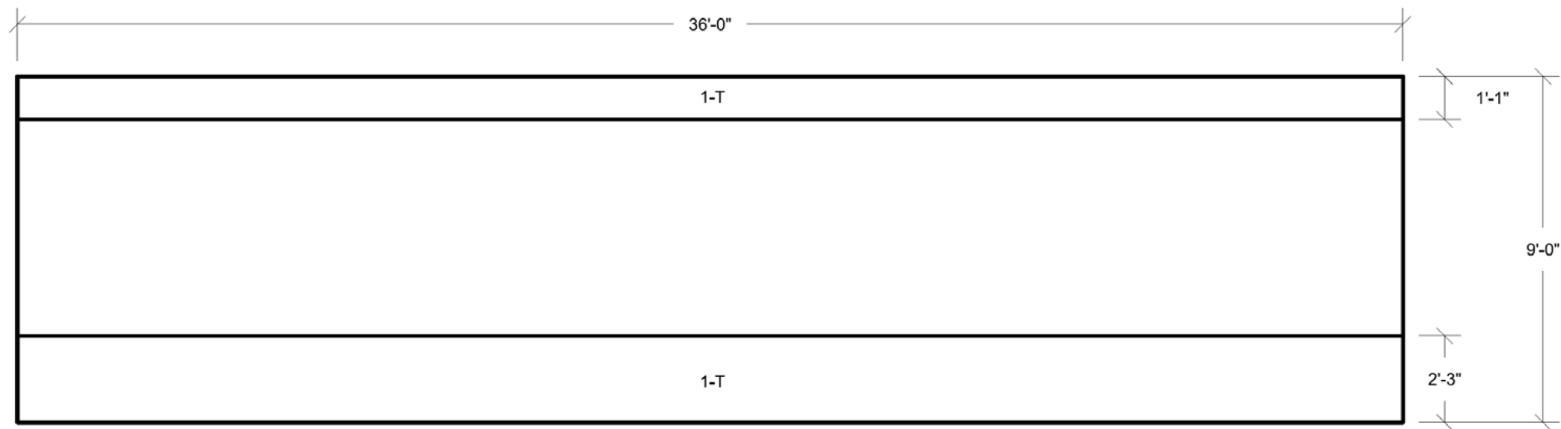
H.7-14A Tunnel Walls Looking From Outside Transverse Reinforcement Zones
